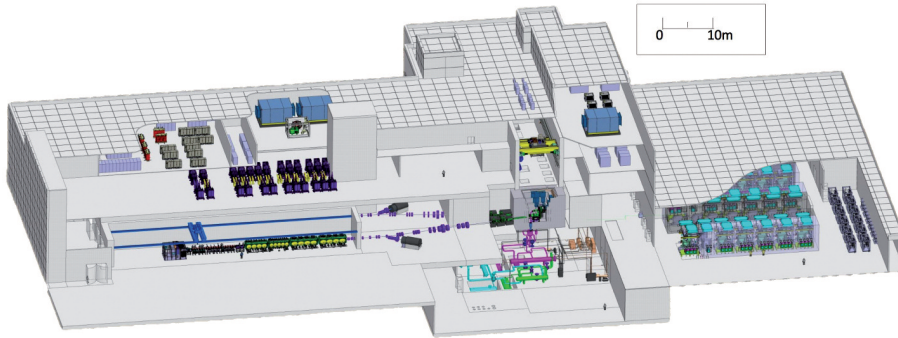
Planned building where all facilities will be installed at IFMIF-DONES. [5]
